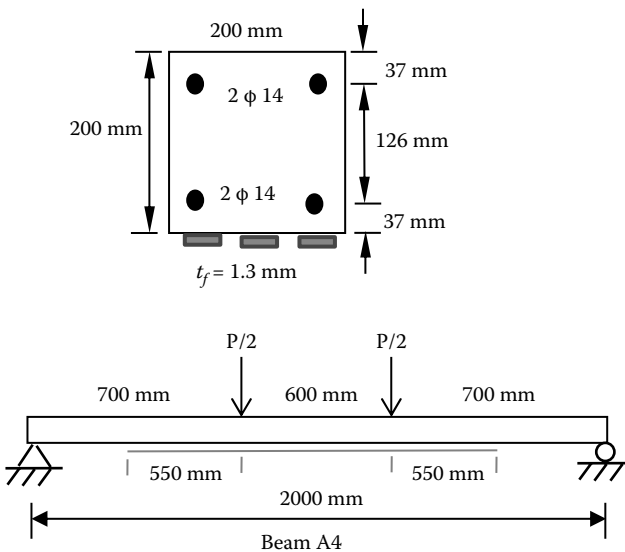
Example 5.14 showing the beam section and profile.
